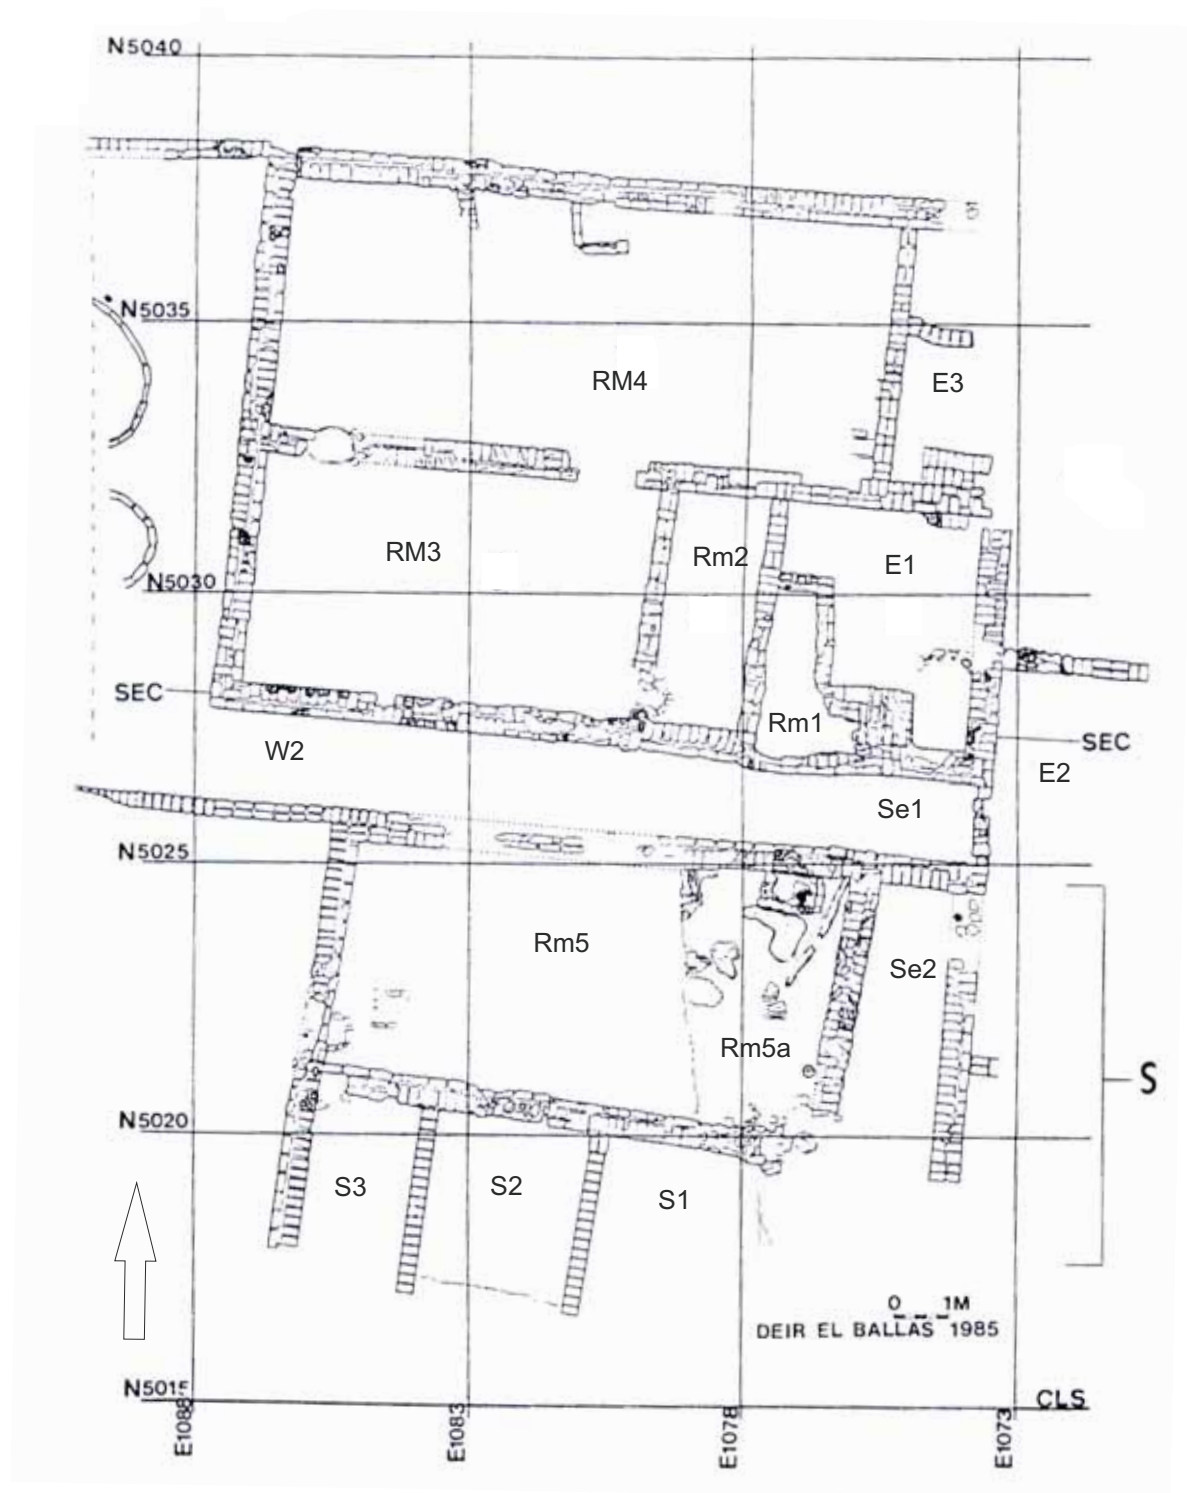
Plan of house E at Deir el-Ballas (Lacovara 1997, 169)
